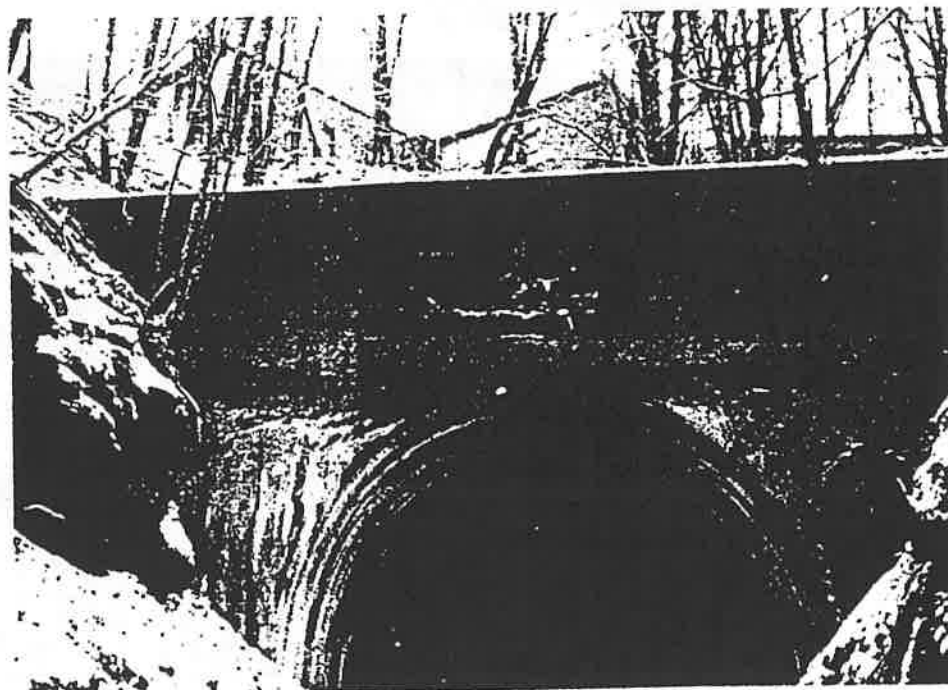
Spalled Brick Lining at Station 15+00±. Note Also Dislodged Portion of Rock Bench Beneath Spalled Area and Heavy Leakage (Ice) Just North of this Area.
